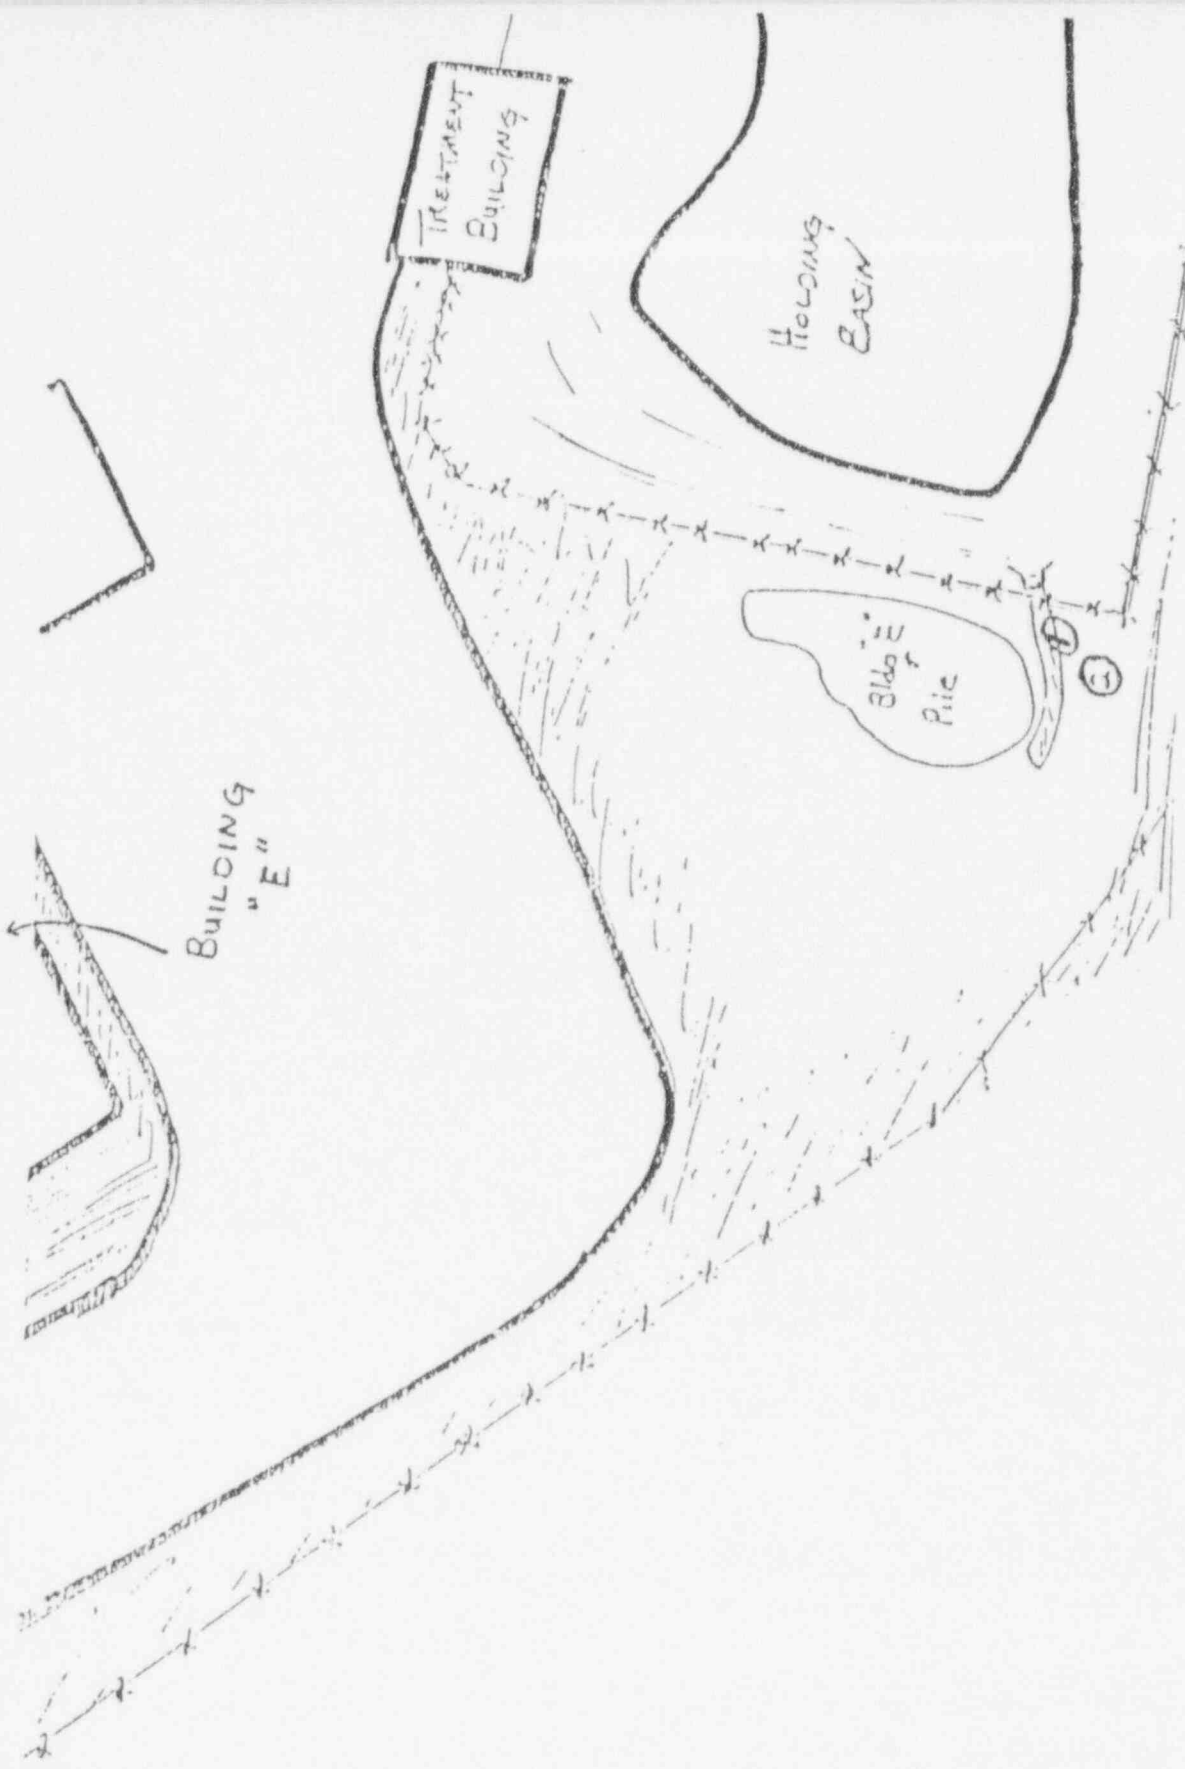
Pile location On Site and Locations of Areas Where Soil Samples Were Collected When Pile was Prepared for Winter and prior to Work in the Summer
